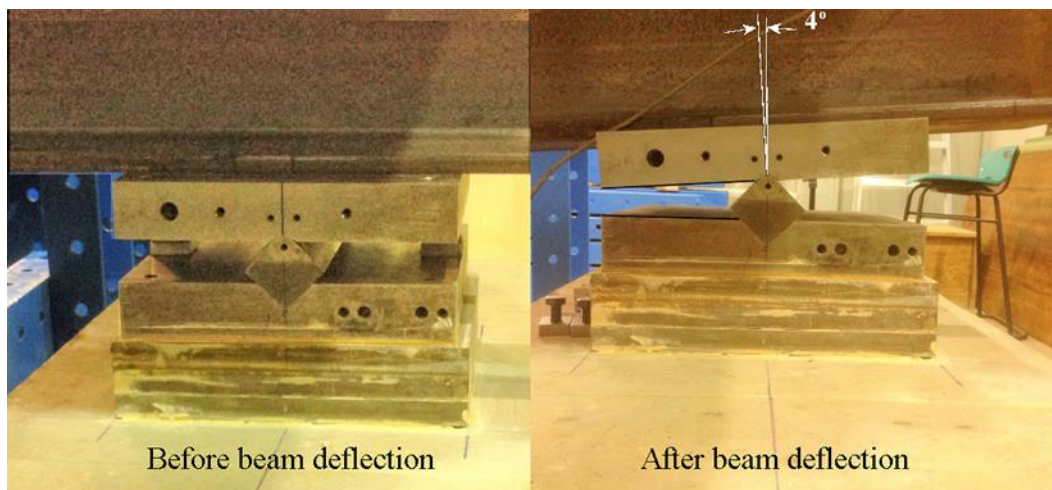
Pinned bearing support (right end) between concrete block and steel beam
